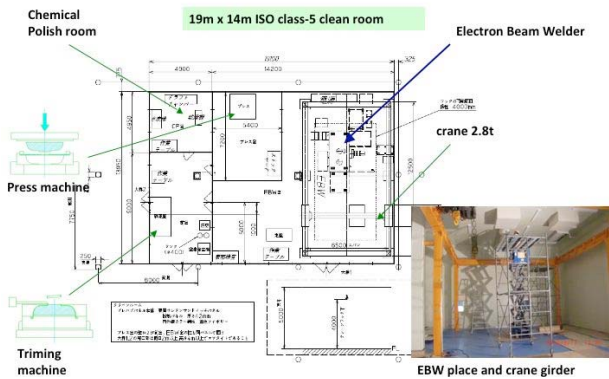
KEK superconducting RF cavity pilot plant floor plan.
